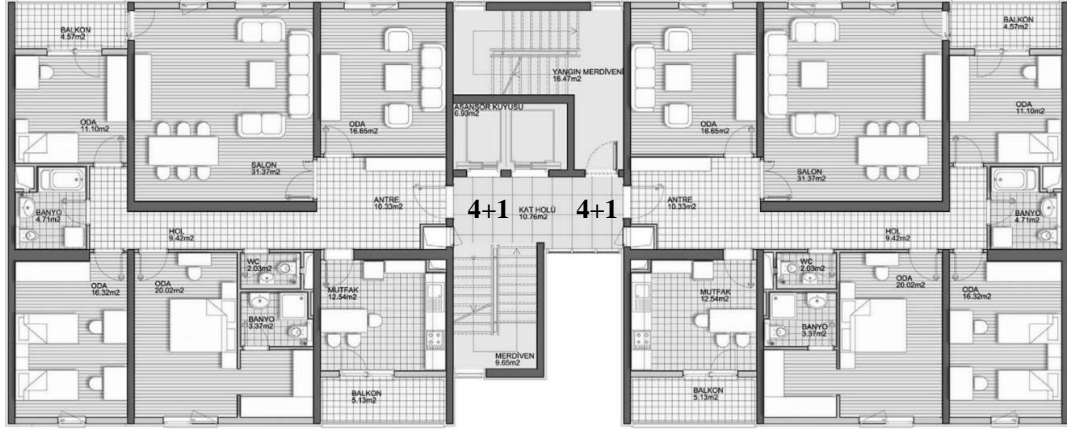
B3 Block Floor Plan 4+1 Apartments
